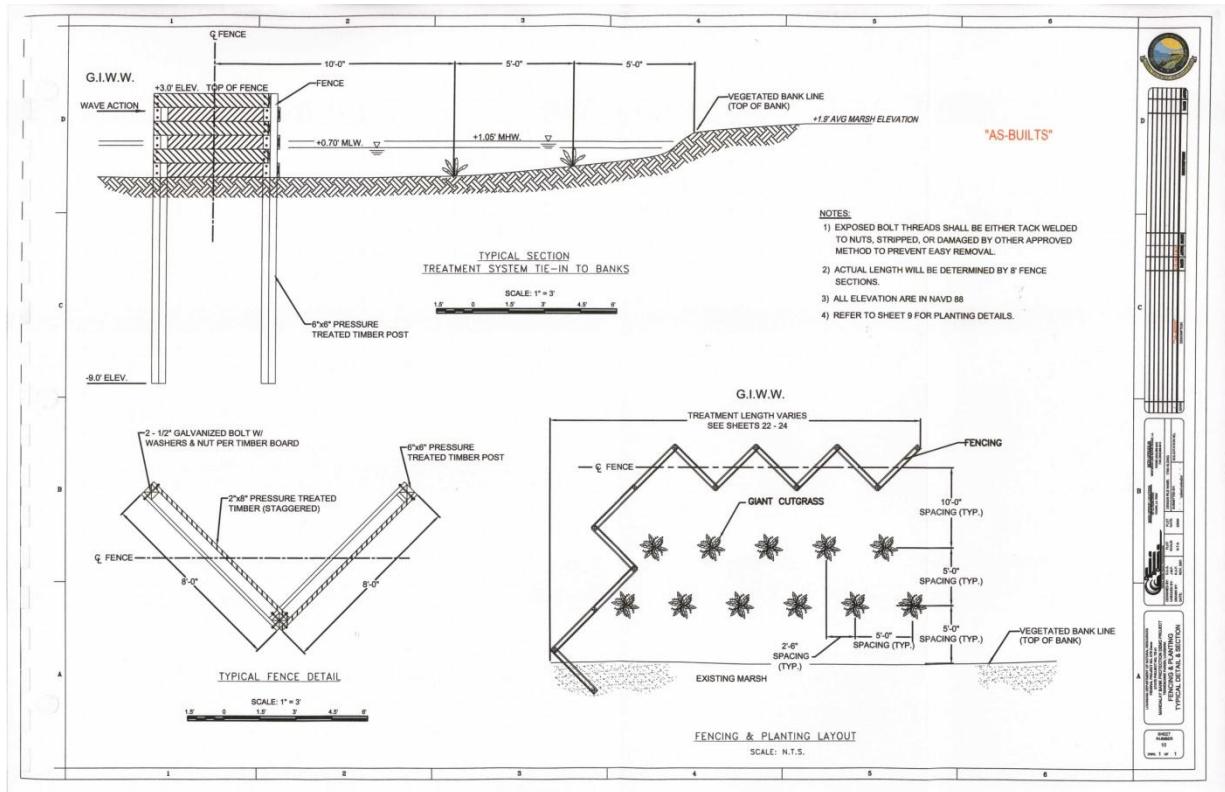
Typical cross section and aerial view depicting the Mandalay Bank Protection Demonstration (TE-41) project's treated lumber fencing (F) structures.
